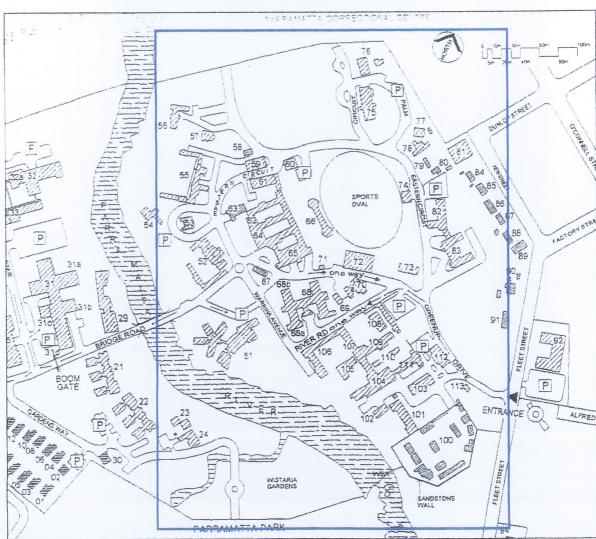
Site plan of the Eastern Campus and Wisteria (Wistaria) Gardens.
